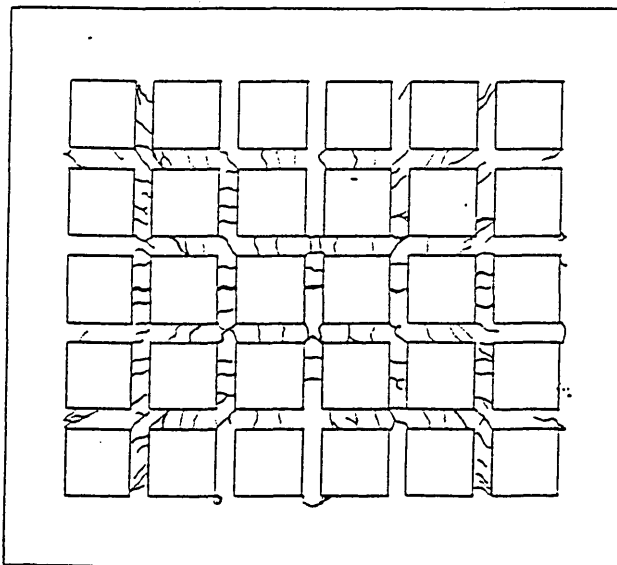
Failure Crack Pattern of R.C.Waffle Model Slab C3
